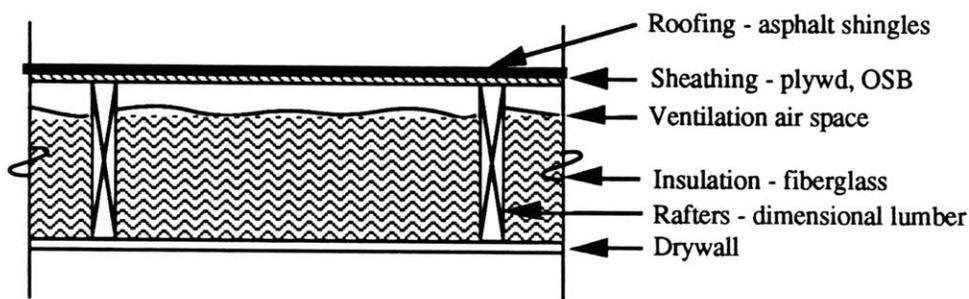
Ventilation in a conventional rafter-framed roof
